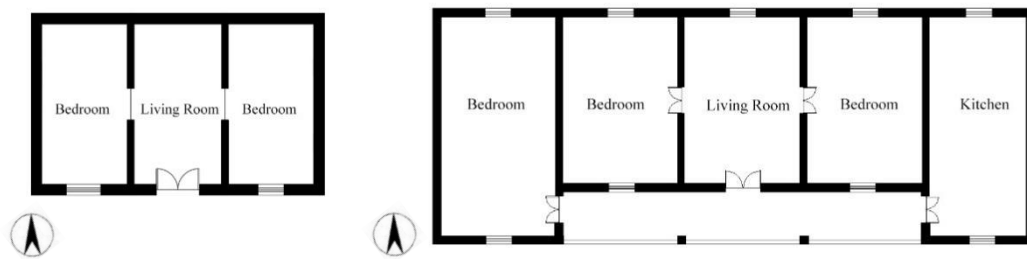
The typical plan layout of the “I”-shaped dwelling
